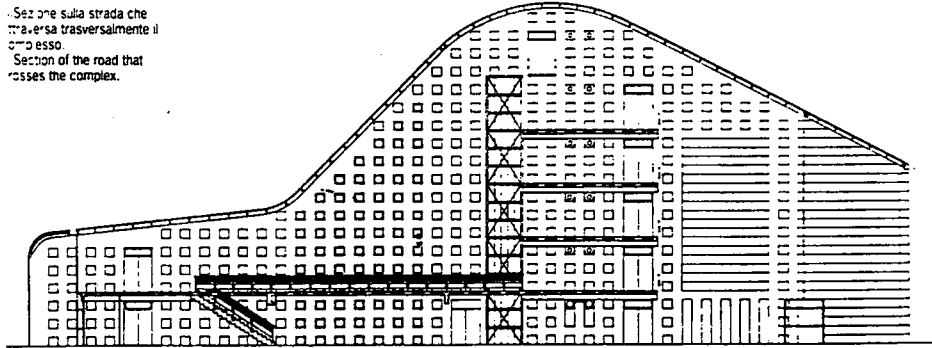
The New University Pole of Dunkerque, Section of the Road
